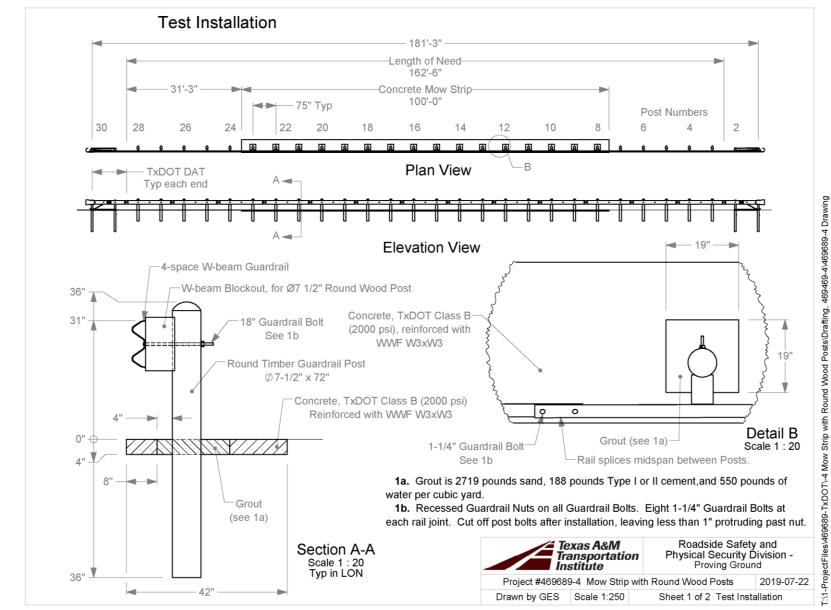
Overall Details of TxDOT W-Beam Guardrail with 7¹/₂-Inch Diameter Round Wood Posts in Concrete Mow Strip.
